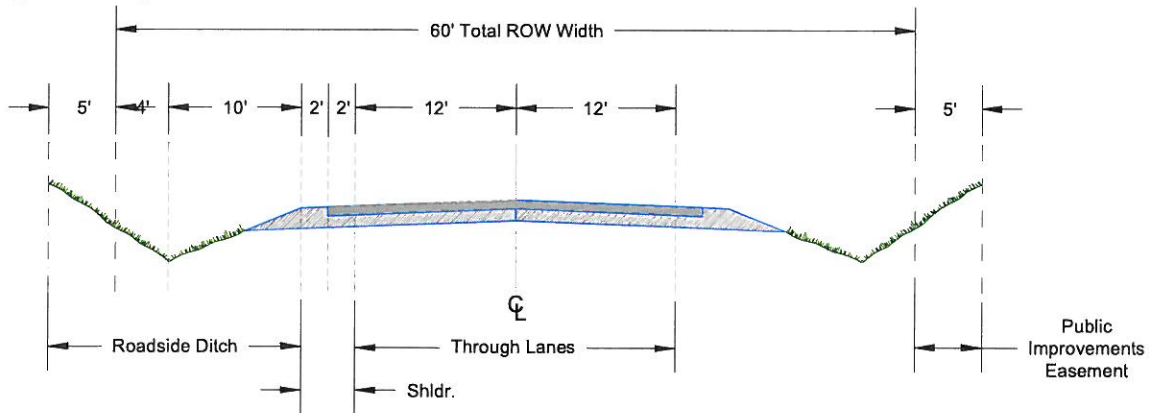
Typical Rural Minor Collector Cross Section
